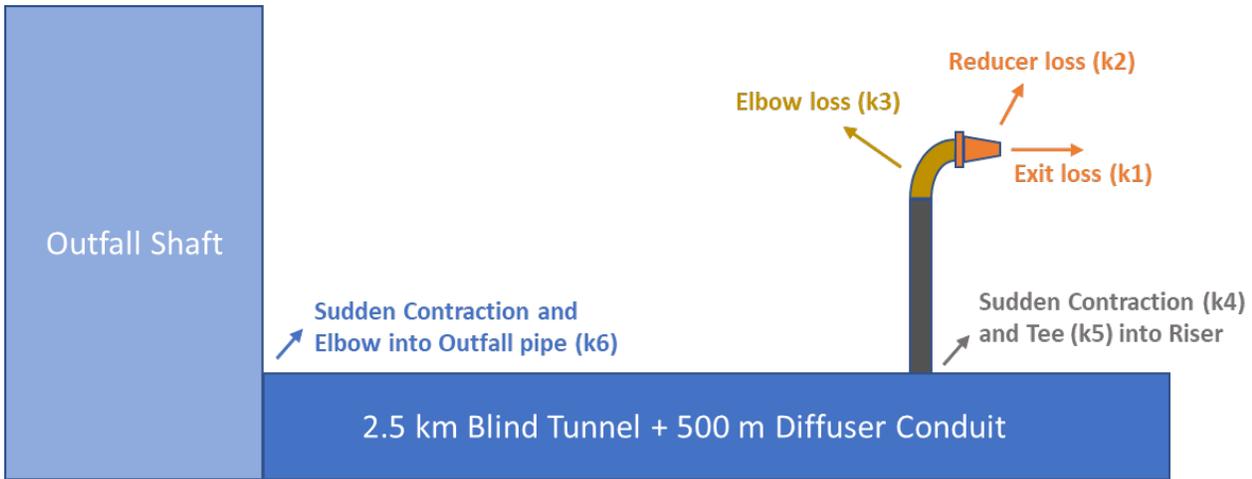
Minor Loss K Factors for Outfall Tunnel, Risers, and Diffuser
